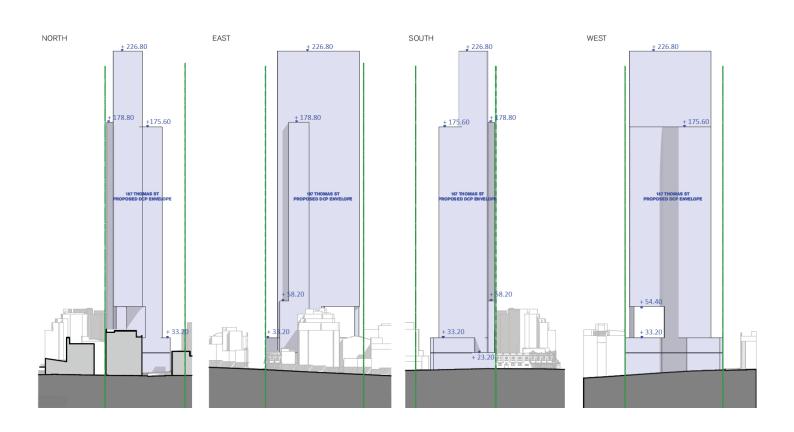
XX 187 Thomas Street, Haymarket - Cross-section of indicative envelope
